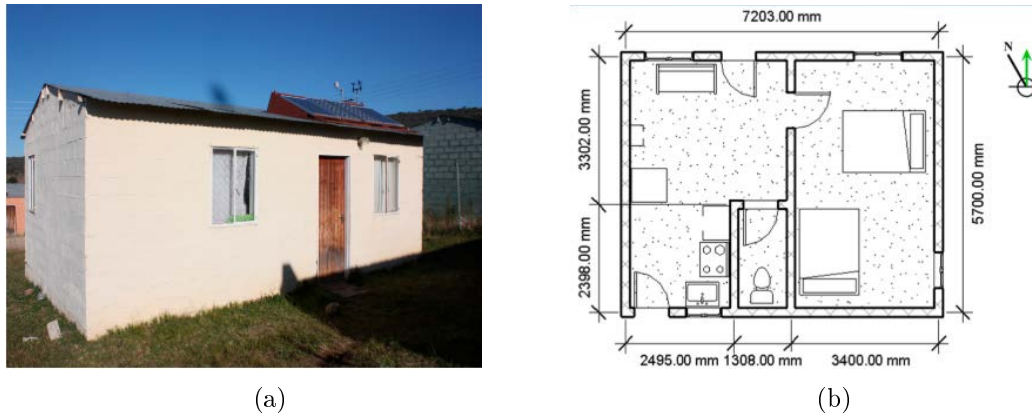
Photo (a) and plan (b) of a typical GSH (Kelvin *et al.*, 2017, p. 6)
